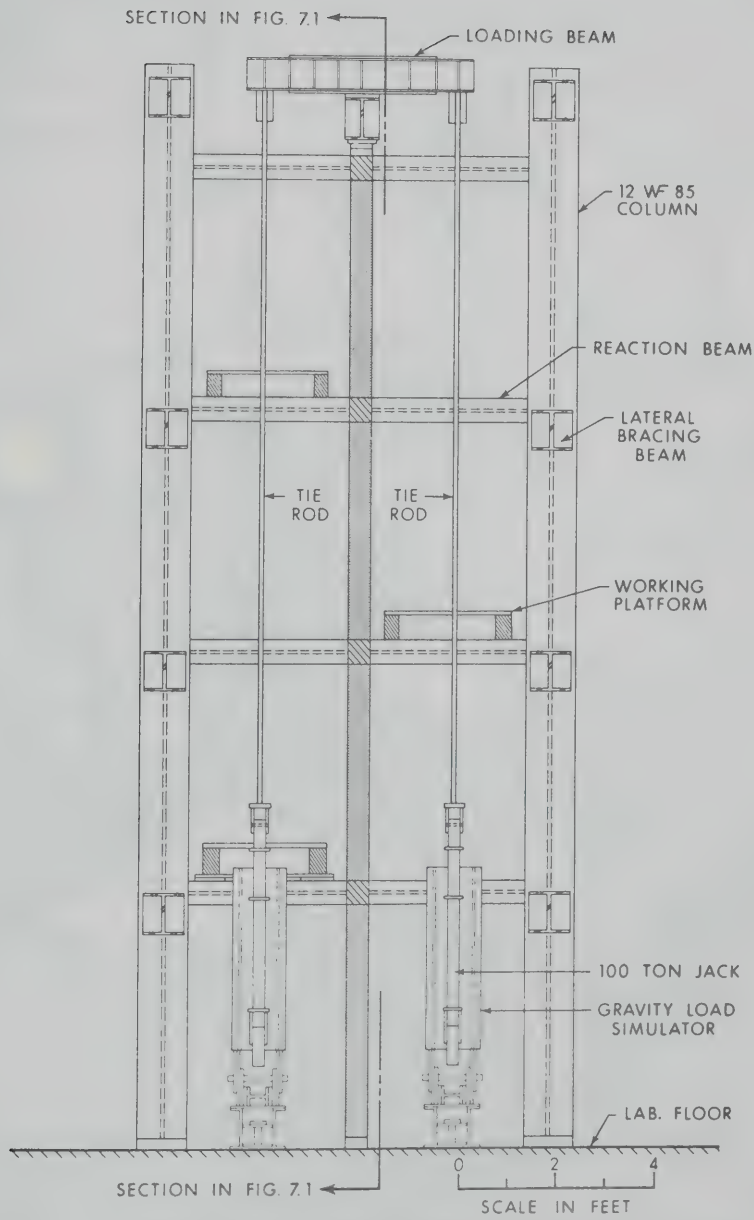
SECTIONAL SIDE ELEVATION SHOWING SPECIMEN, TESTING FRAME, OBSERVATION PLATFORM AND VERTICAL LOADING DEVICE
